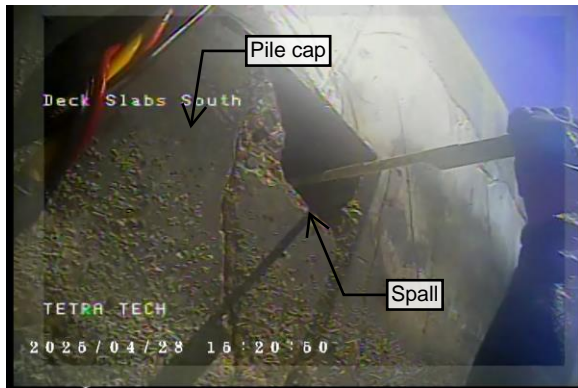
Large spall on pile cap to pile cap joint
